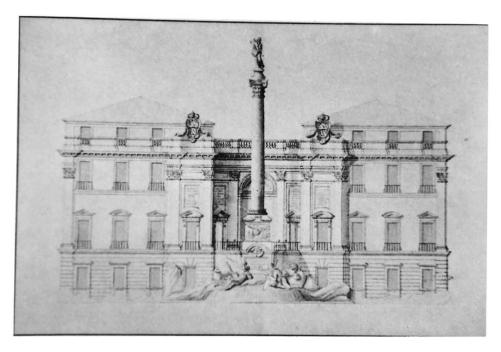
Luigi Vanvitelli: the plan for the column at the Trevi fountain (1730).
